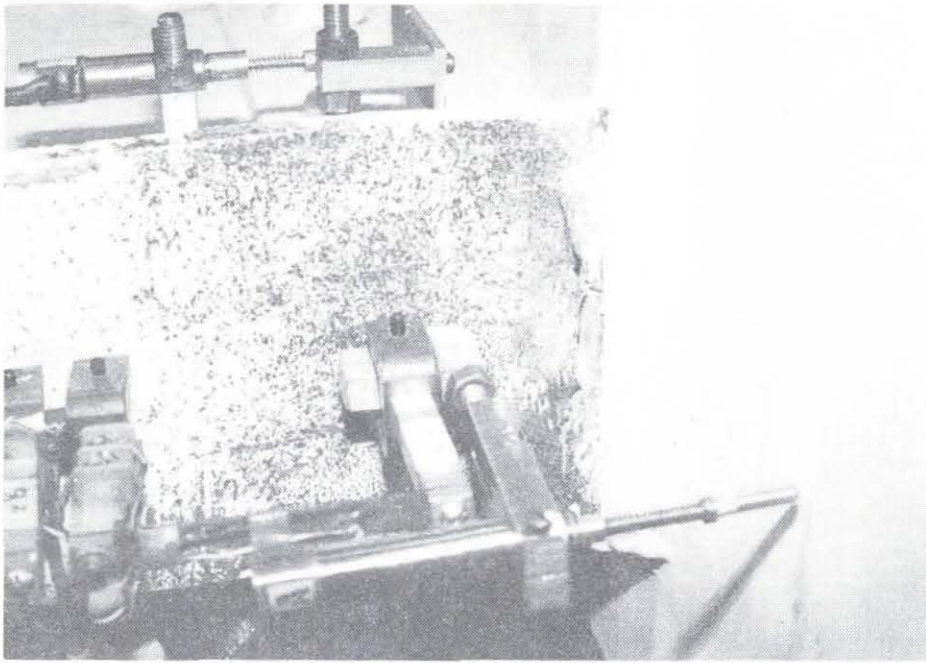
Fracture of Top Flange (Specimen 18)
